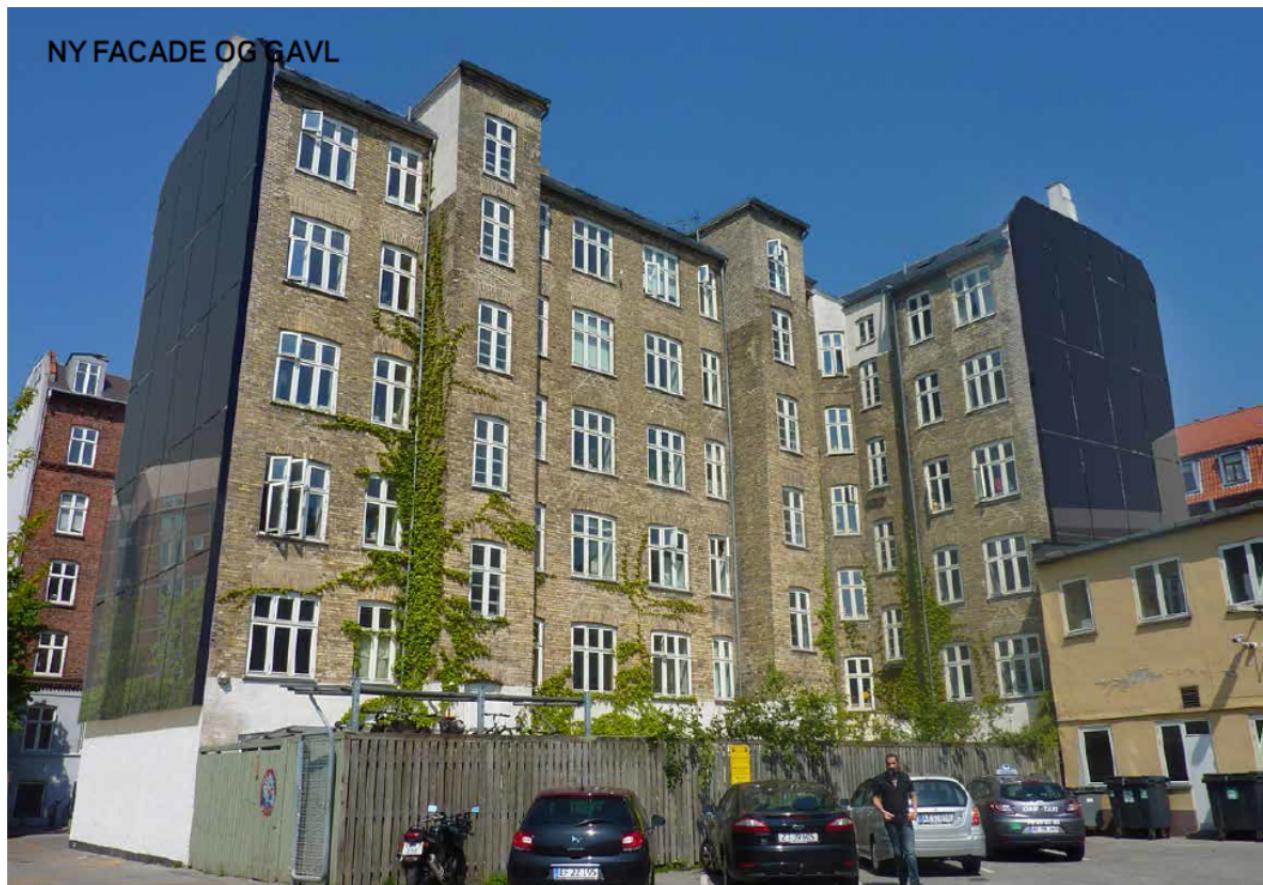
An Architects view of the demonstration installation, on two walls in Nørrebro Copenhagen.
